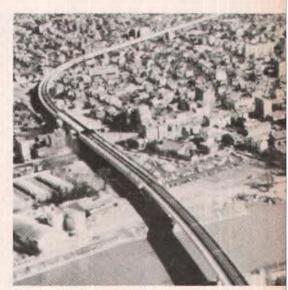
The Marne LaVallée Viaduct, Paris, France, was built with precast box girders assembled in balanced cantilevers using a launching gantry.
